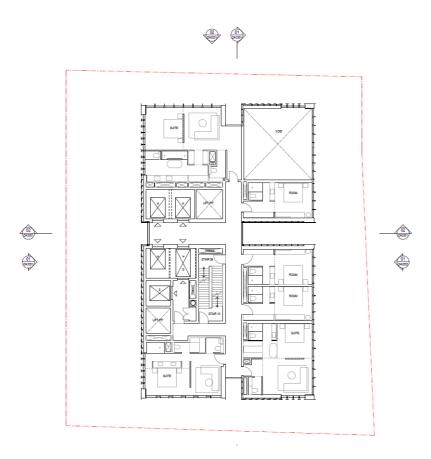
| Proposed level 56 (Source: Woods Bagot)
